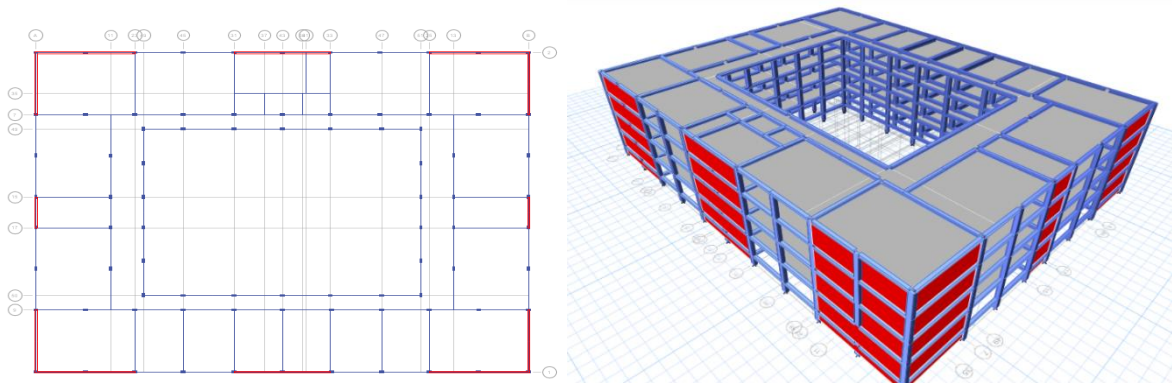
Elevation plan & 3D view for 20% slab opening with shear wall at corner and periphery of the wall.
